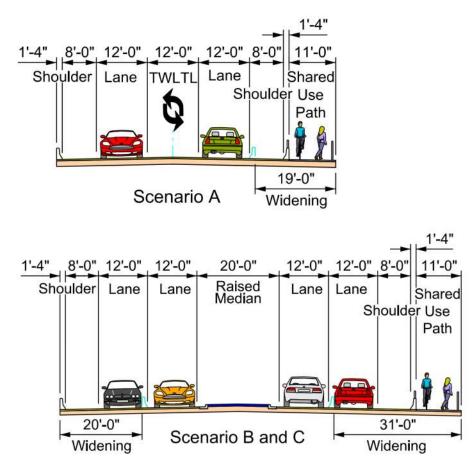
US14 Bypass/Structure # 06-166-150 Typical Sections
